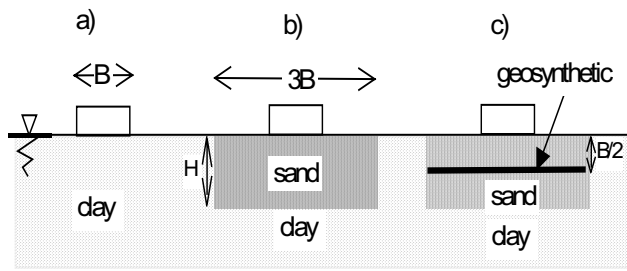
Centrifuge loading tests of a shallow strip footing on three different soil foundations
